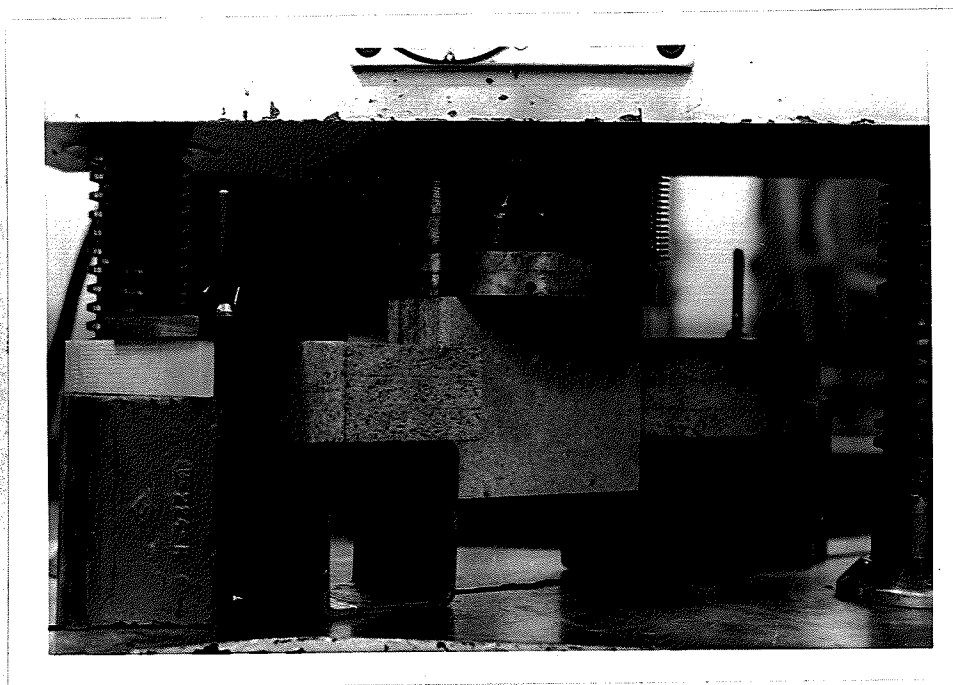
Assembly of Specimen for Shear Test
